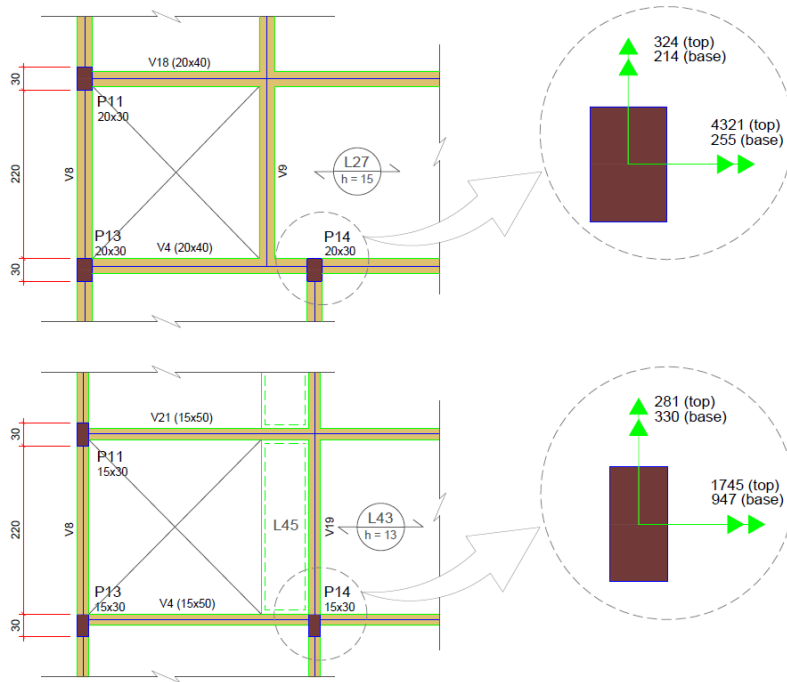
Column P14 before and after the continuity of the beam balancing the bending moment
